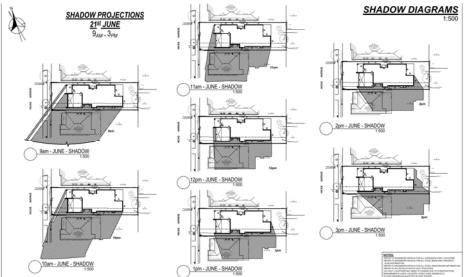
Proposed hourly shadow diagram- 9am-3pm June 21 for proposed dwelling
